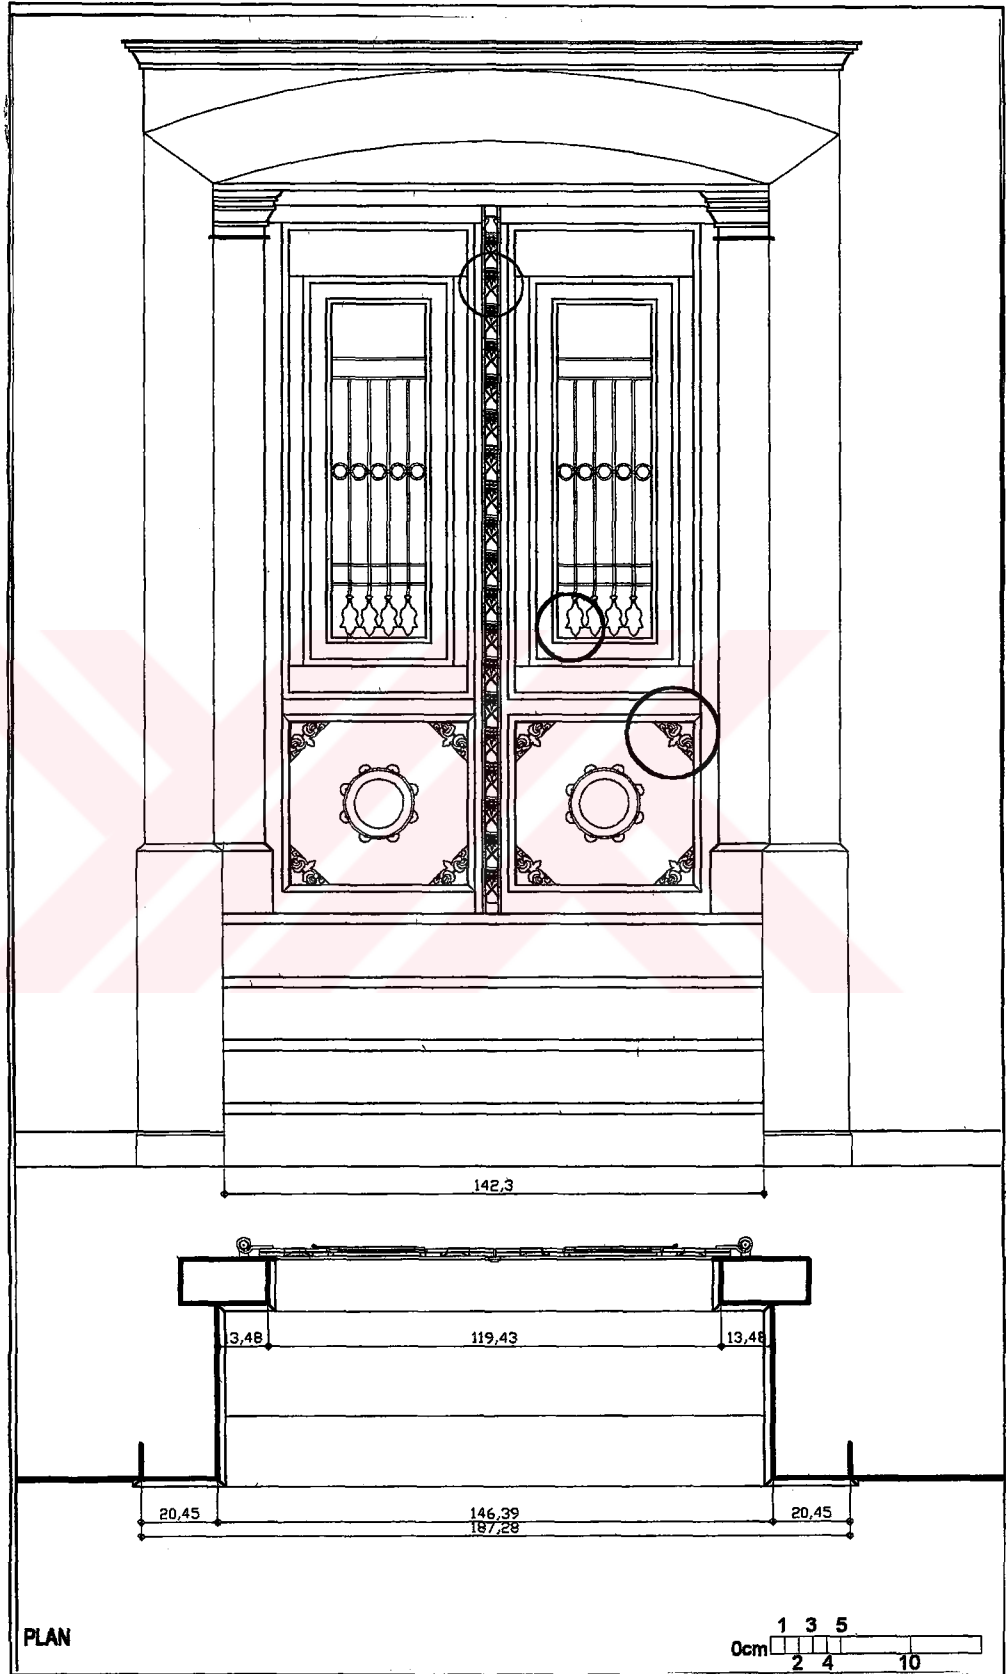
DM03 Fevzi Çakmak Caddesi No 40- Exterior Elevation and Plan
